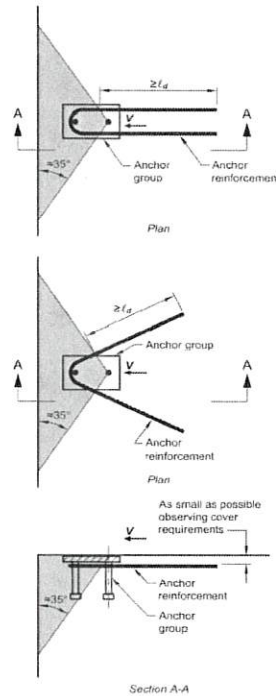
(a) - Hairpin anchor reinforcement for shear.
